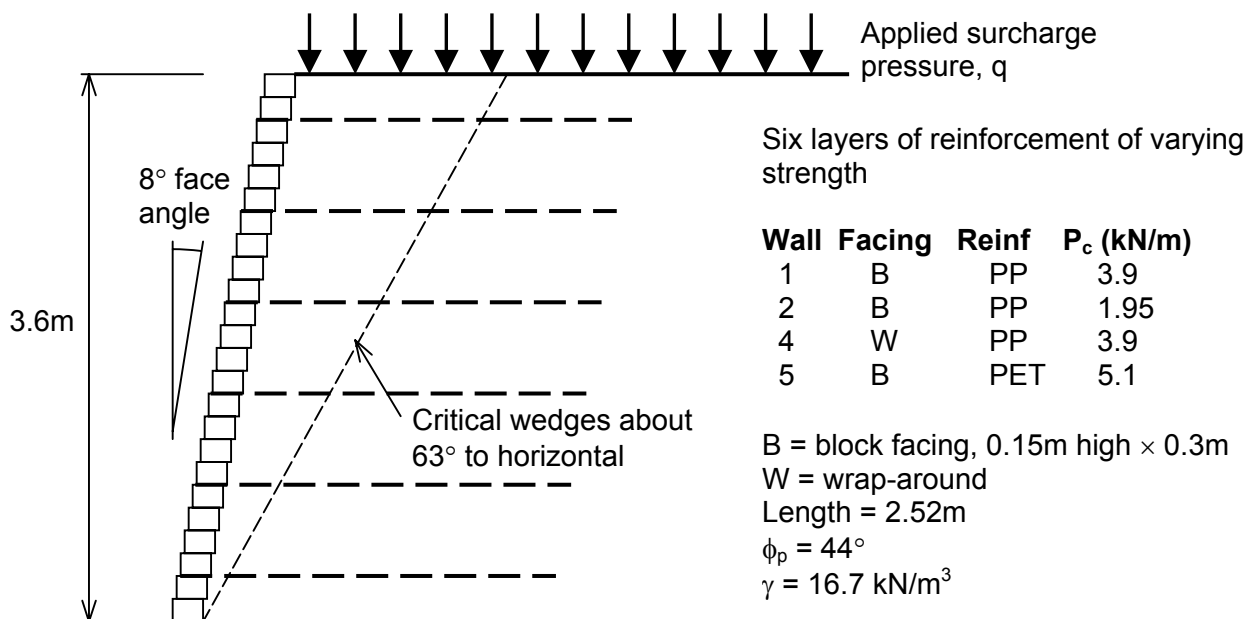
Full scale test walls reported by Bathurst et al, 2001
